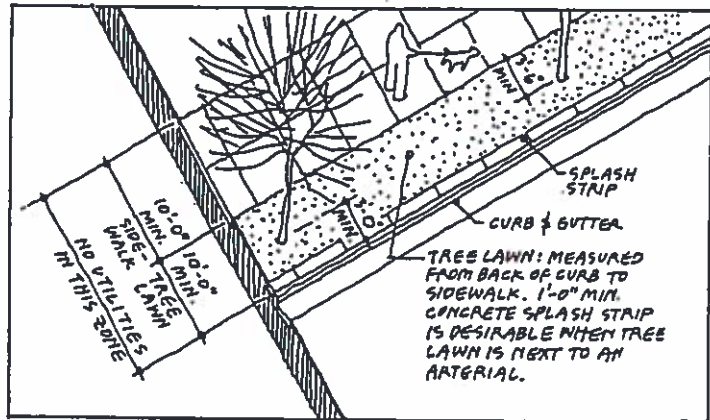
A EXAMPLE SHOWING A TREE LAWN / DETACHED SIDEWALK CONDITION
